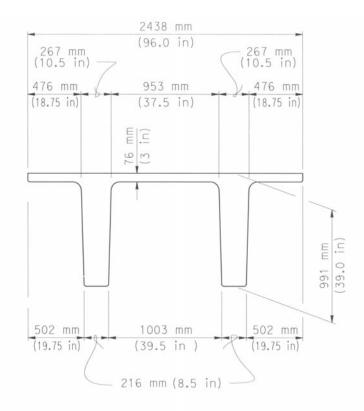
Proposed Dimensions of Non-Standard Double Tee Girder.
